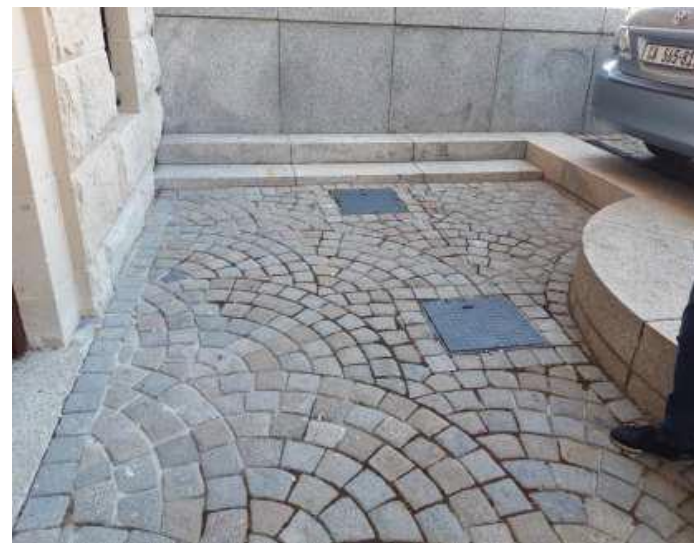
Location of Proposed Ramp along the retaining door wall at the back. Secondary Entrance door to the left – step on the right to be dropped down by 50mm. Furthest stormwater drain to be raised.
